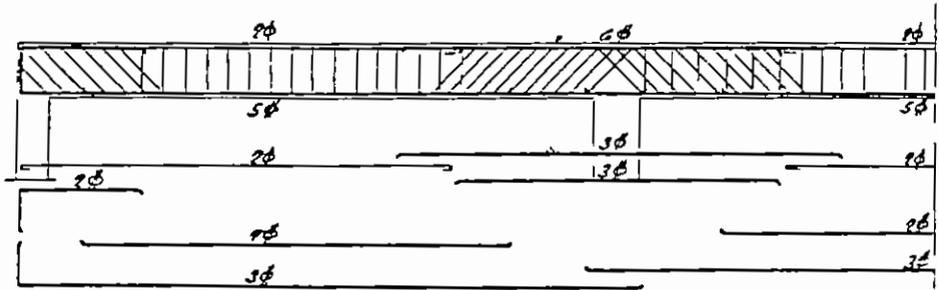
Use of straight steel bars and inclined stirrups in continuous girders
